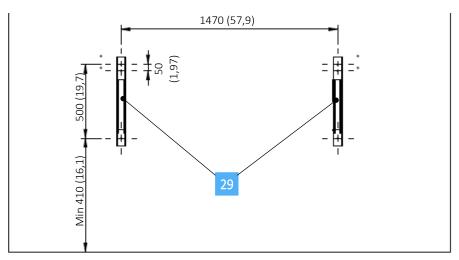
Placement of support stirrups to the wall. Dimensions mm (inch).
